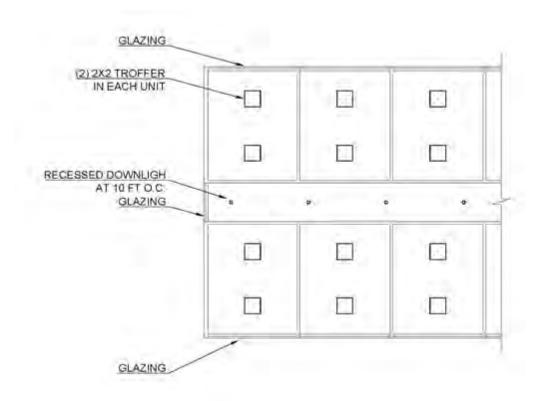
Project Typical Floor Interior Unit Lighting Layout
